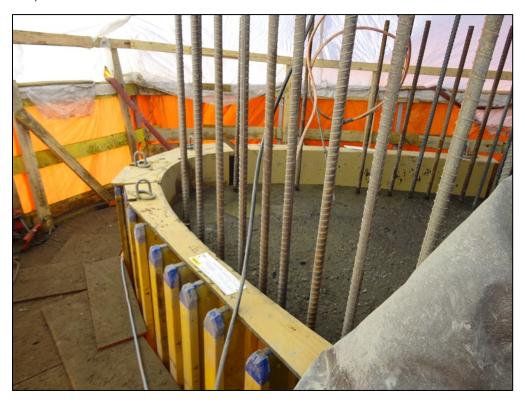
Spillway; Upstream nose of Pier 3. (November 26, 2014)
